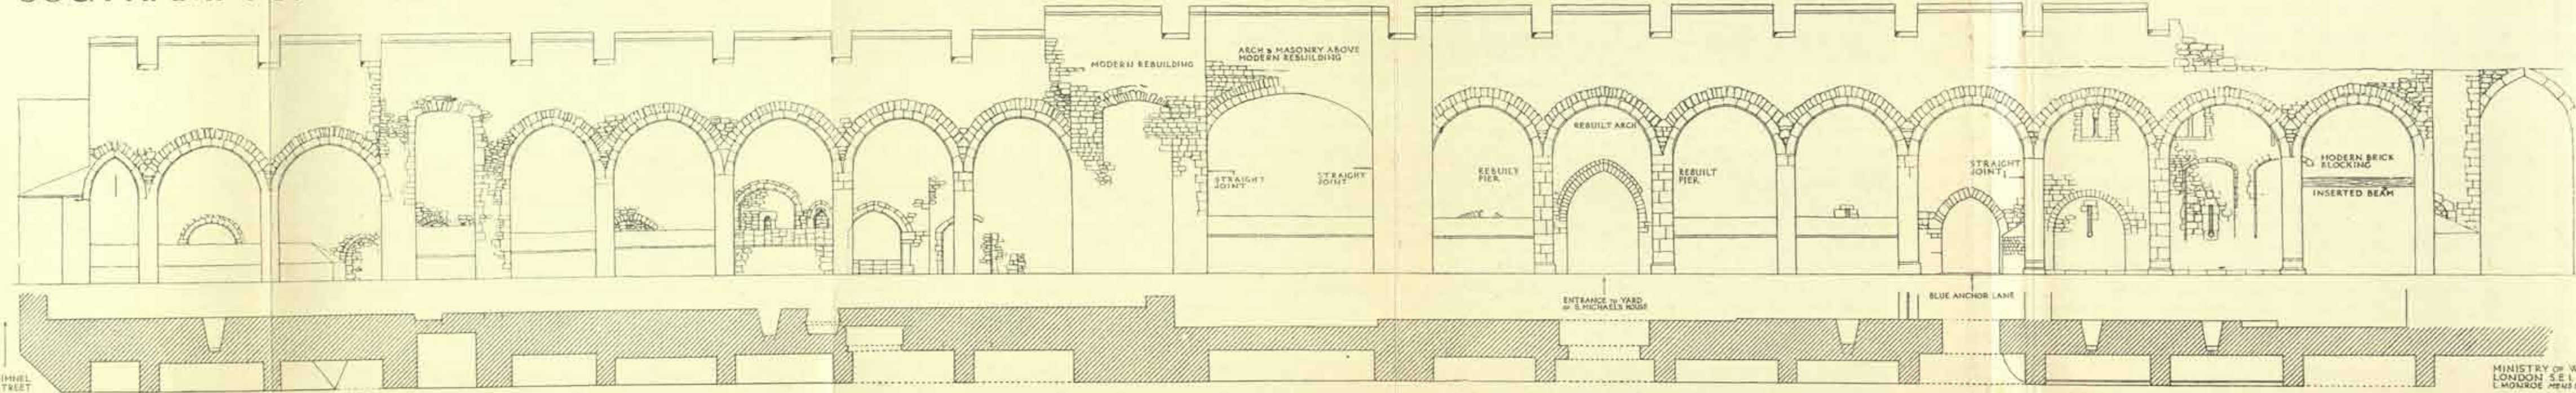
External elevation and plan of the Arcade, Western Shore, Southampton
